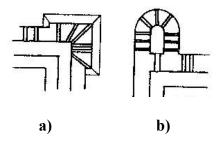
a) Ancient paxsadevor castle angles in plan view and b) pictures - Corner Corners;
